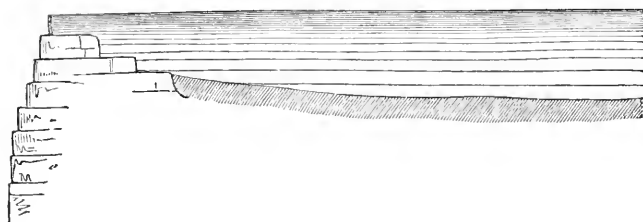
Section through Overfall!.—Scale, 8 feet to 1 inch.
